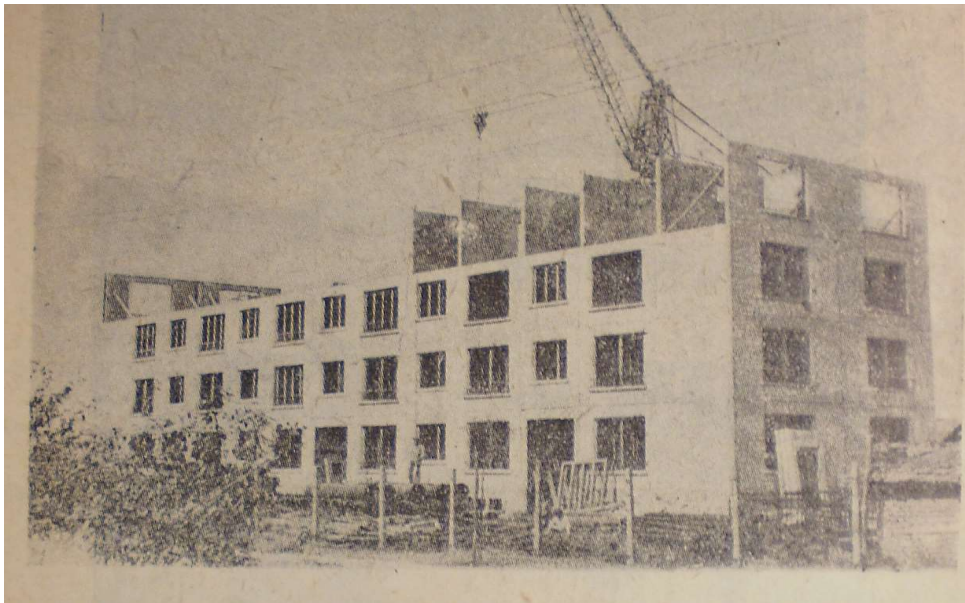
The first panel building in Bulgaria - photo from 1958 (Source: [Sandacite](#))
